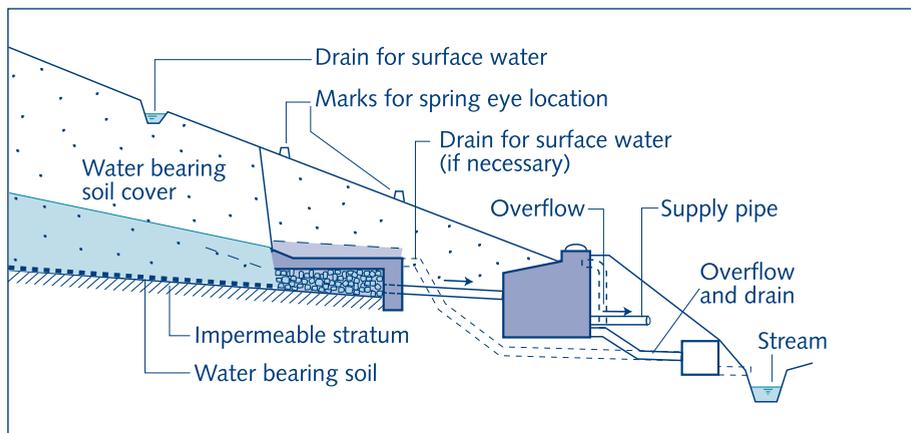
Lay-out of a spring water collection area (Adapted from Helvetas Cameroon, 1985)
